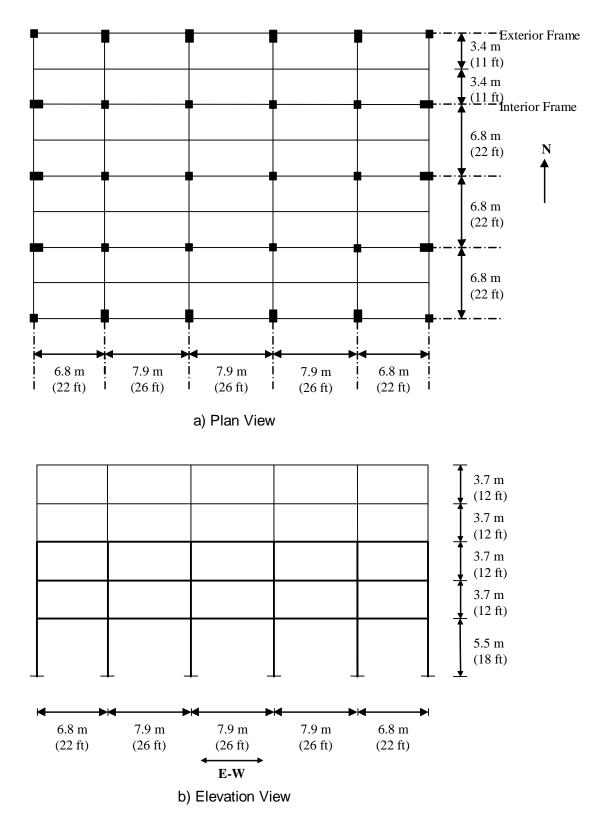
Plan and Elevation View of the Building used in the Analytical Study
